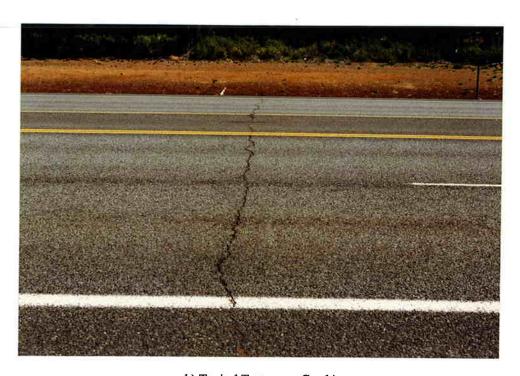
1993 Pavement Condition, Section 5 - AC-20
